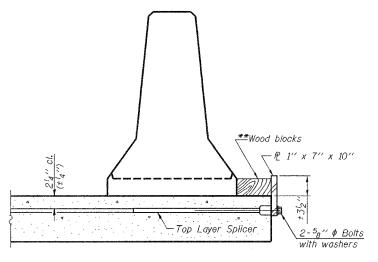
Detail I - With Bar Splicer or Couplers: Connect one (1) 1"x7"x10" steel P to the top layer of couplers with 2-58" \$\phi\$ bolts screwed to coupler at approximate @ of each barrier panel.
